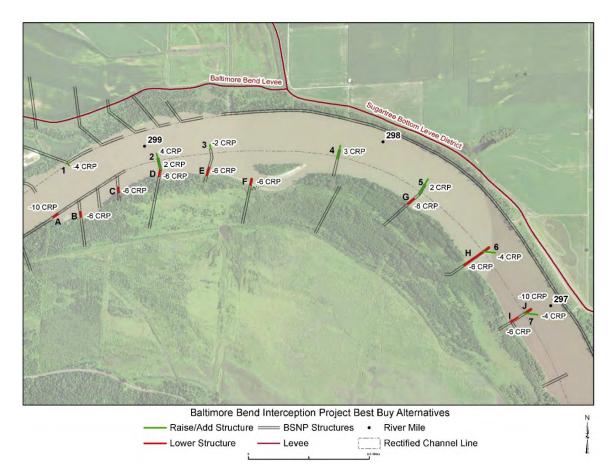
The Recommended Plan would result in a net benefit of 9.24 AAHUs of IRC. Numbers with + or – in front represent the elevation in feet of the structure compared to the construction reference plane.
